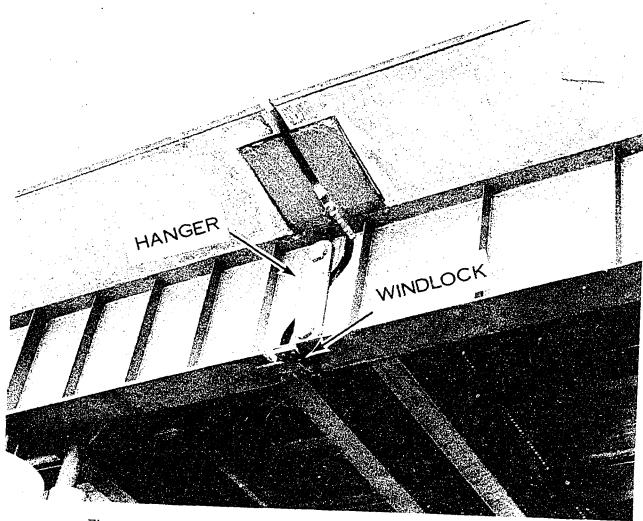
Cantilever girder hanger connection. This type of connection permits both translation and rotation.
